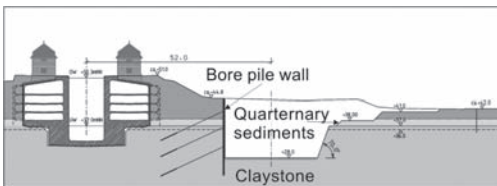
Cross section of the excavation pit for the new ship lock in Minden.
